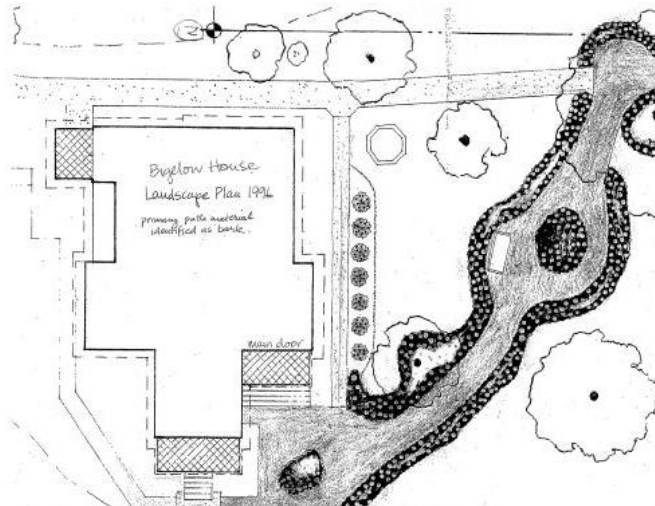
Bigelow House and Proposed Site Plan. 1996. Bigelow House Preservation Association Documents.
